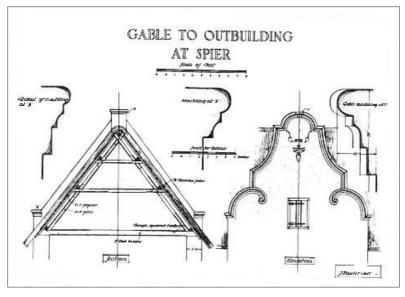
Details of a gable and timber roof structure of Spier outbuilding Source: Pearse, 1968: 19
